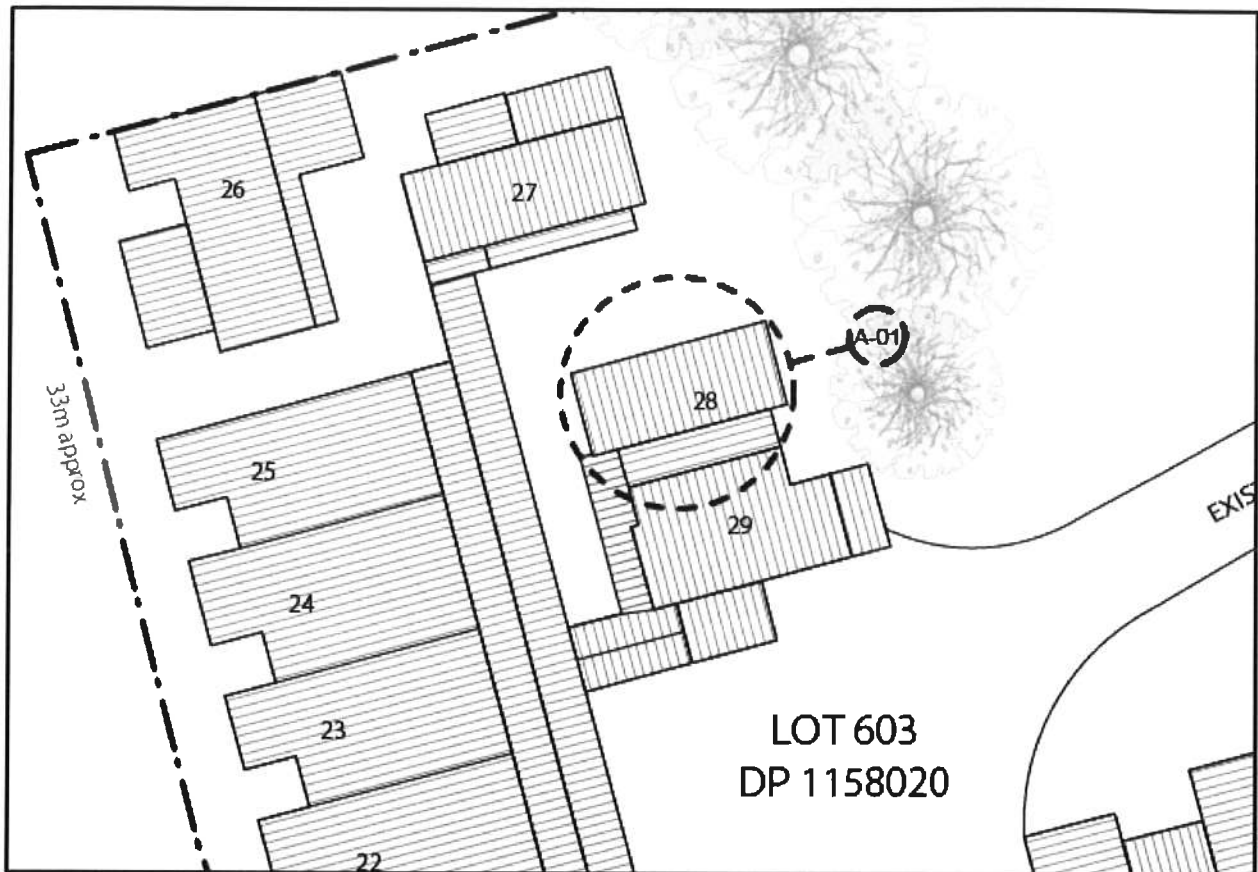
Unit 28 The Stables (Source: Applicant's submitted plans)
